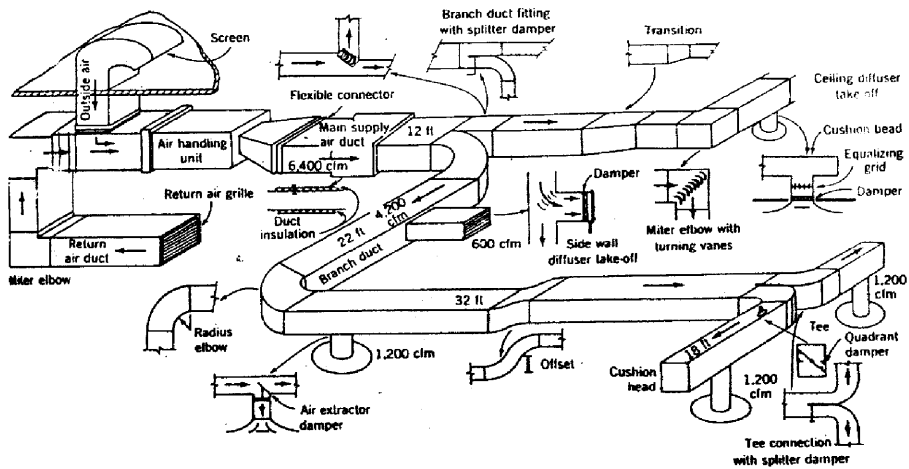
Phantom layout of two A/C systems showing certain ductwork details and commonly used fittings
